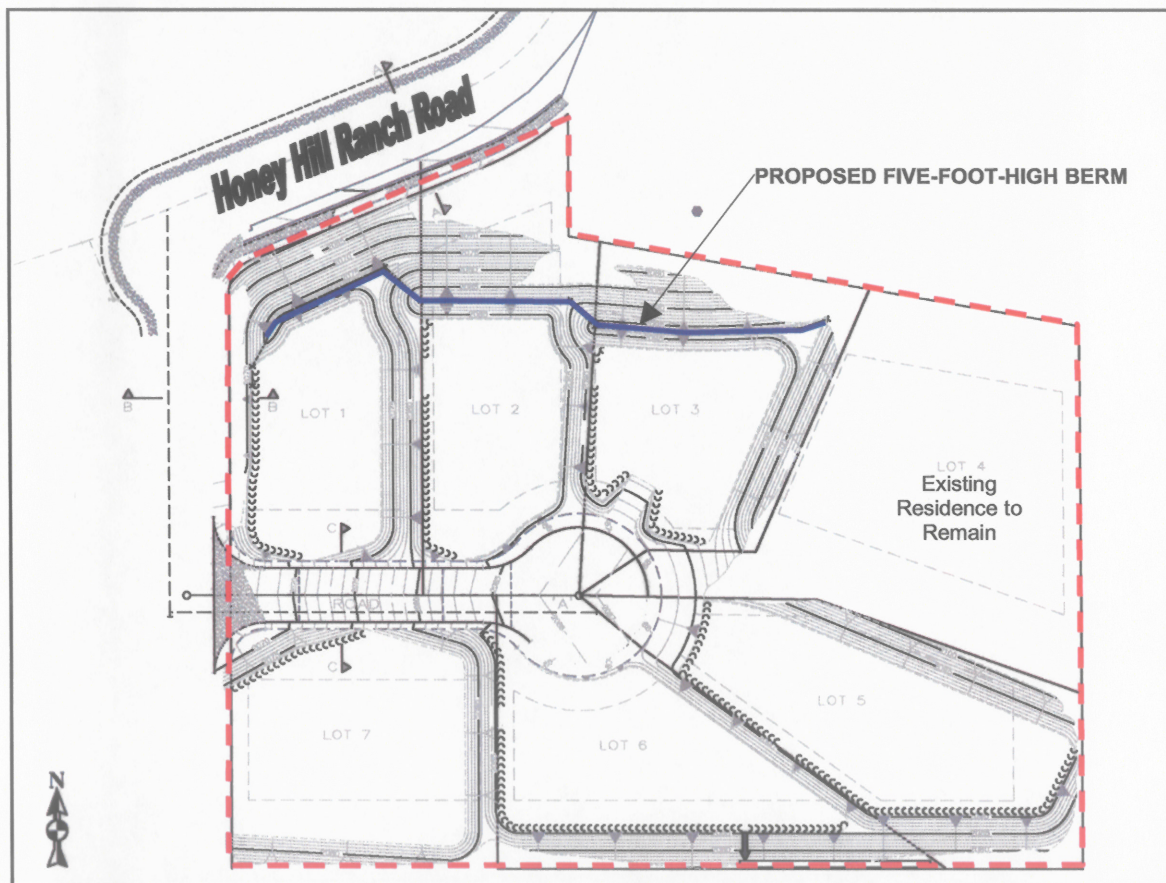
Proposed Honey Hill Ranch Road Site Plan (Snipes-Dye Associates, 8/05)
